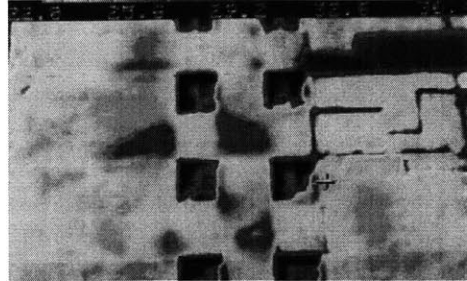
A computer-enhanced tomogram of a wall in a building under repair (Stanley and Balendran 1994).
